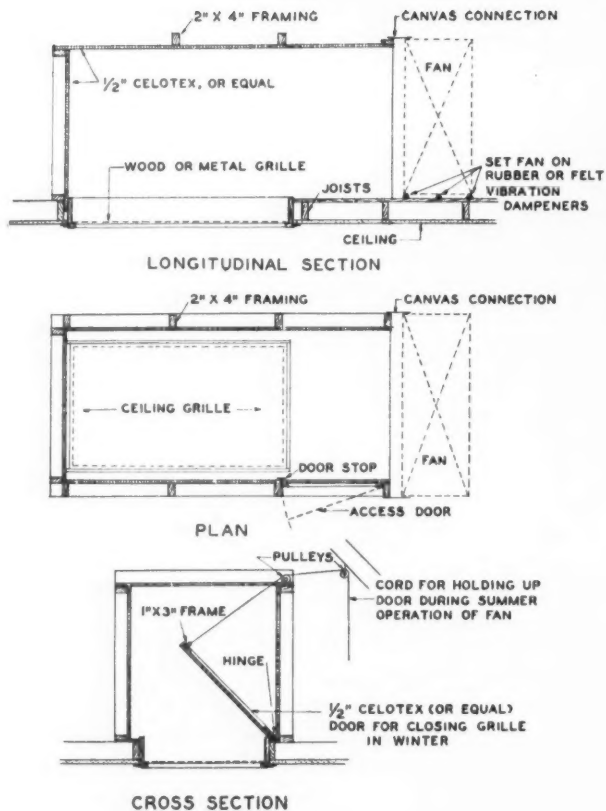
Construction details of a suction box. Note framing on outside to reduce friction. Note hinged trap and fusible link to close grille in case of fire.
